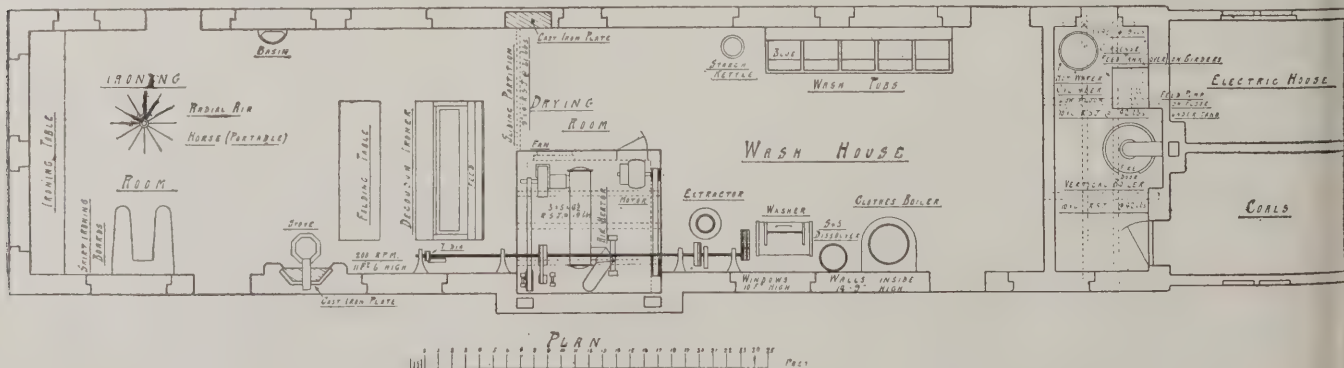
PLAN OF LAUNDRY FOR A PRIVATE HOUSE.
